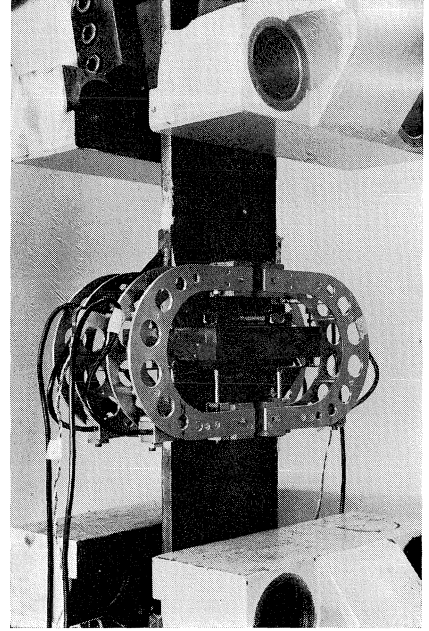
Tests specimen with equipment to measure the bolt forces.
